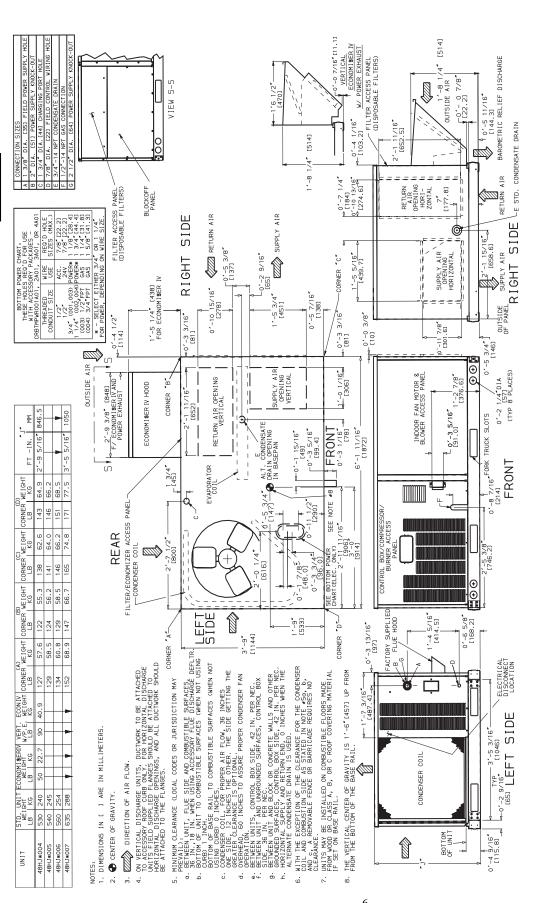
48HJ004-007 Base Unit Dimensions
